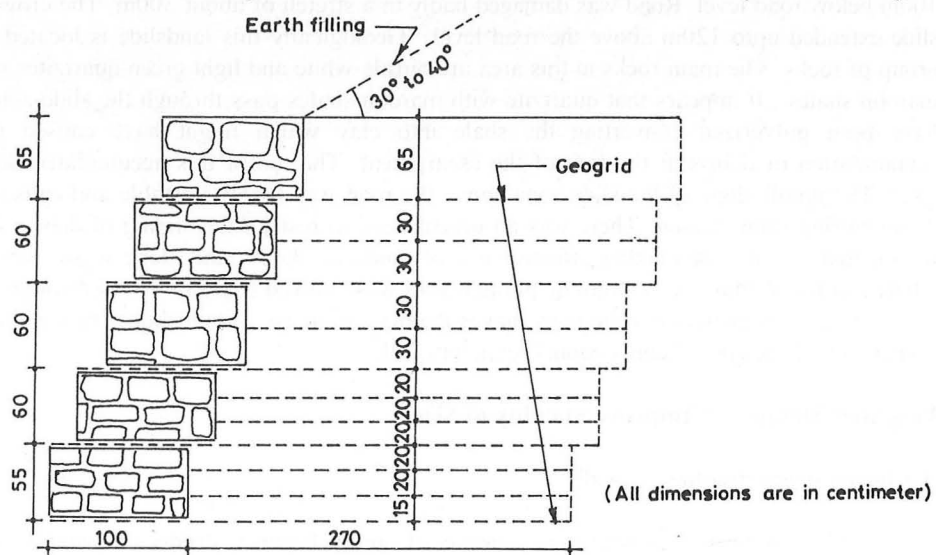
Cross-Section of geogrid reinforced gabion wall
